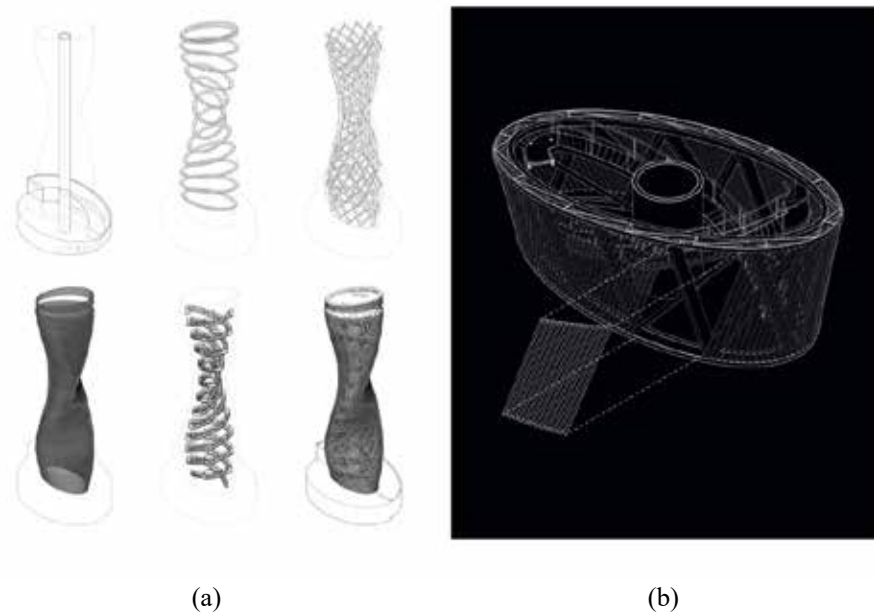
Construction of the tower: (a) (top L-R) concrete core, steel rings, diagrid, (bottom L-R) wood lattice, spiral stair, composite, (b) elliptical truss made of multiple layers clad in wood lattice.
